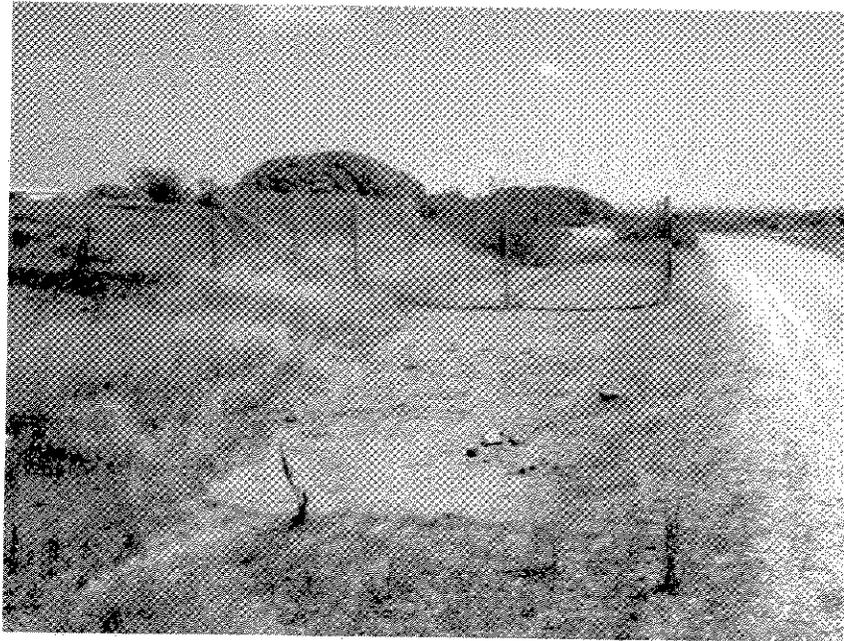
EW012 After Cysts-Bearing Soil Removal
